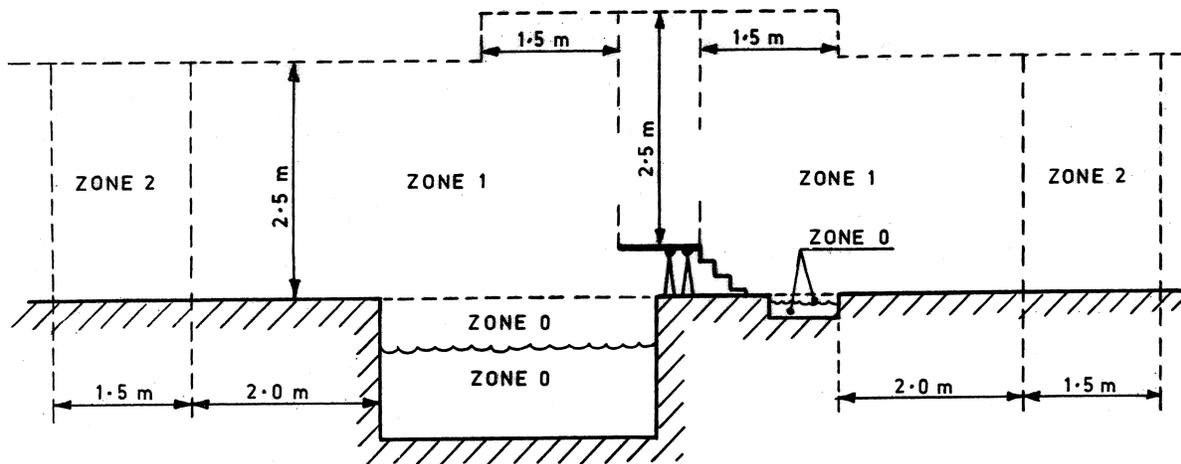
ZONE DIMENSIONS OF SWIMMING POOLS AND PADDLING POOLS
